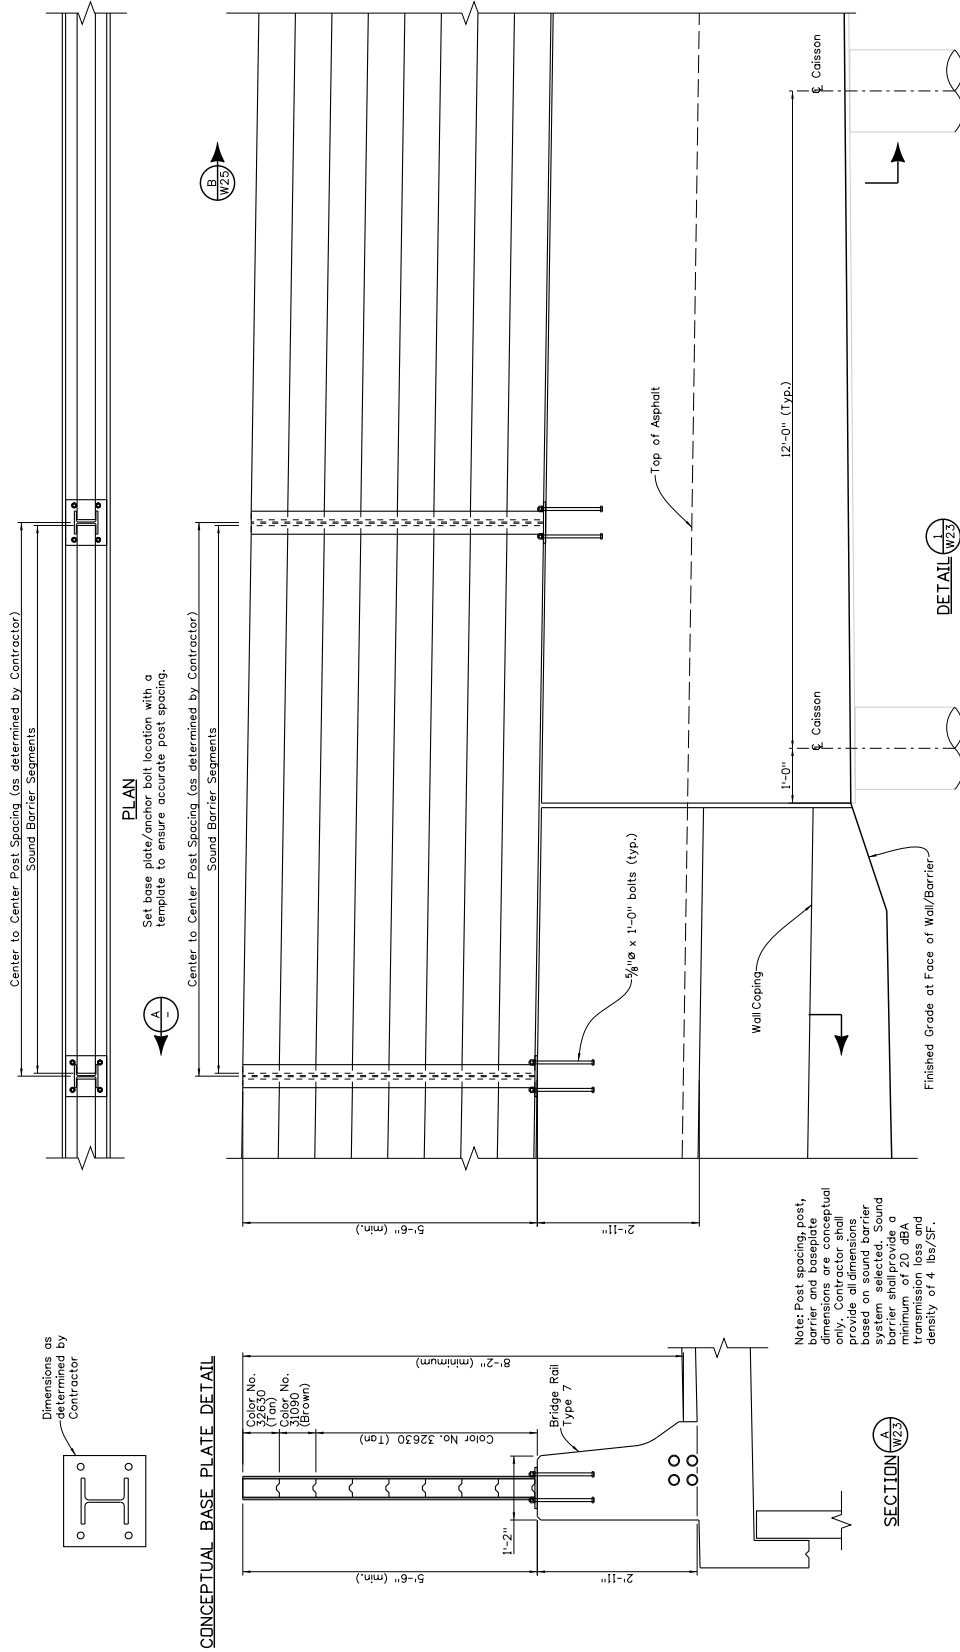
Sound Barrier on Bridge Example
